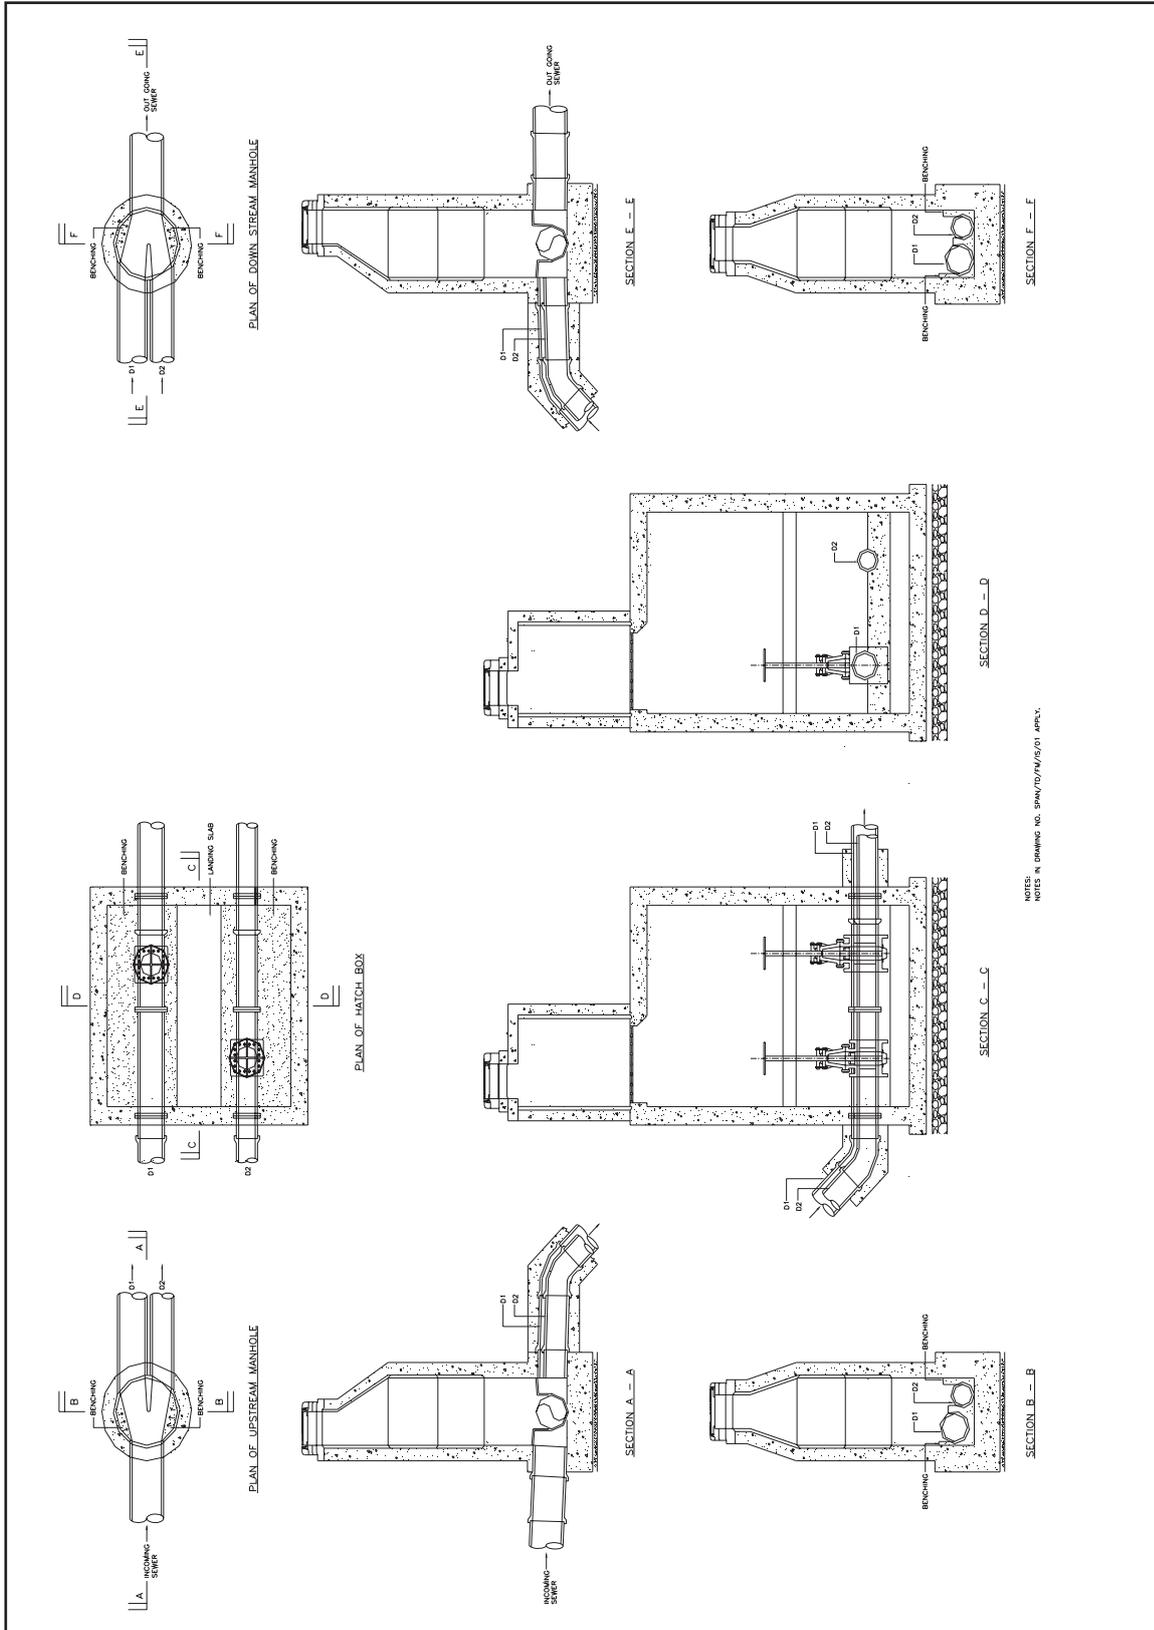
(a) : Typical Details for Force Main – Scour Valve and Receiving Manhole
